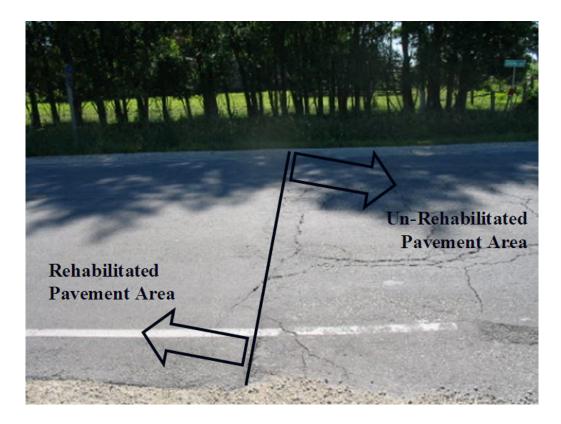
Cracks created at the interface between rehabilitated pavement and unrehabilitated pavement
